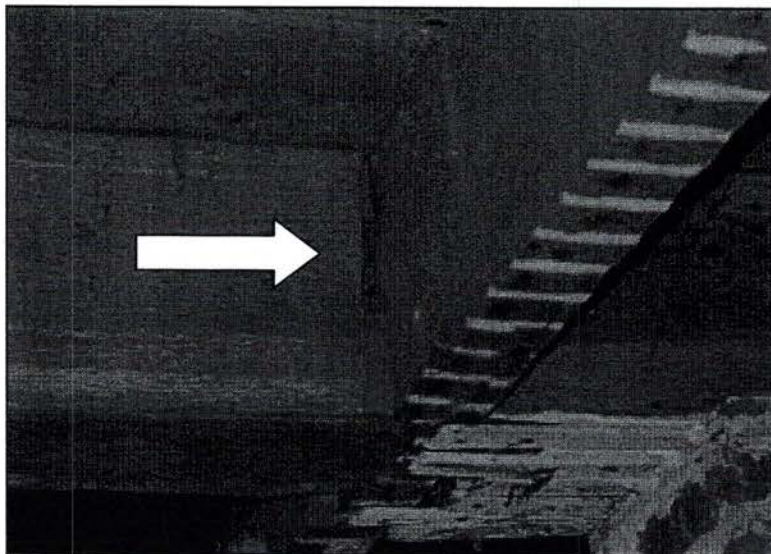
Detail of mortise and tenon joint connecting the floor joists to the girt in Room 000. Remnants of plaster lath can be seen in the lower right corner.
